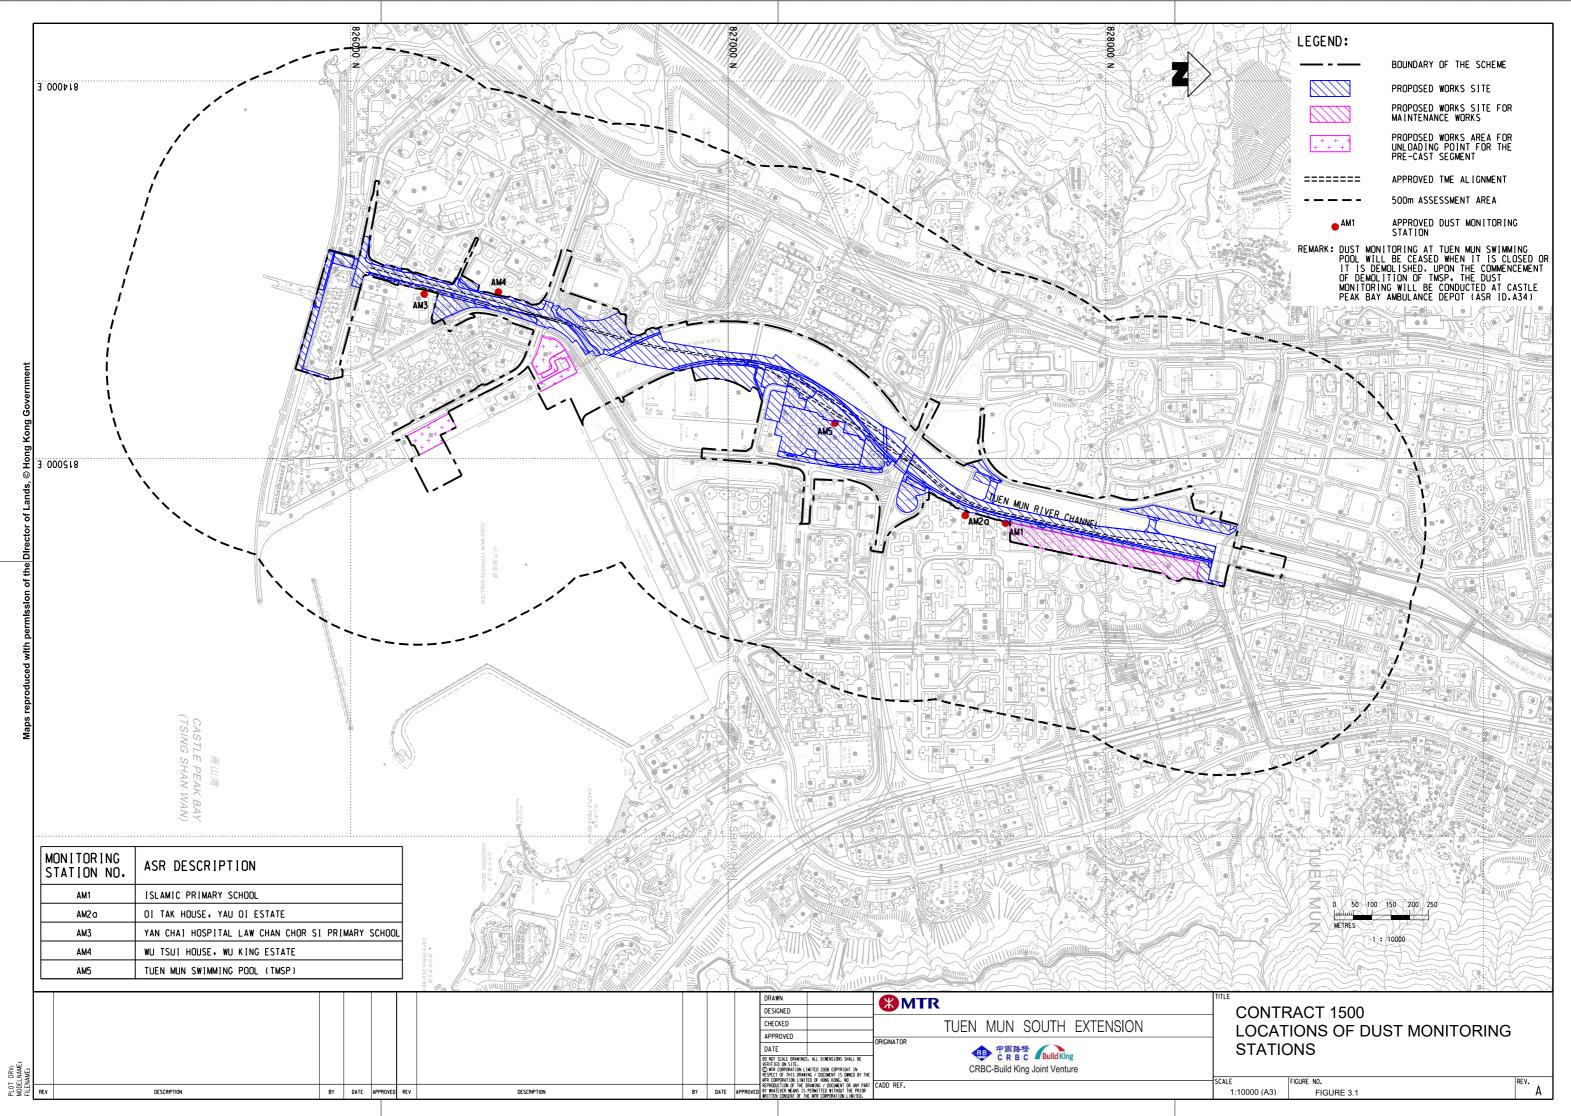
Locations of Construction Dust Monitoring Stations
